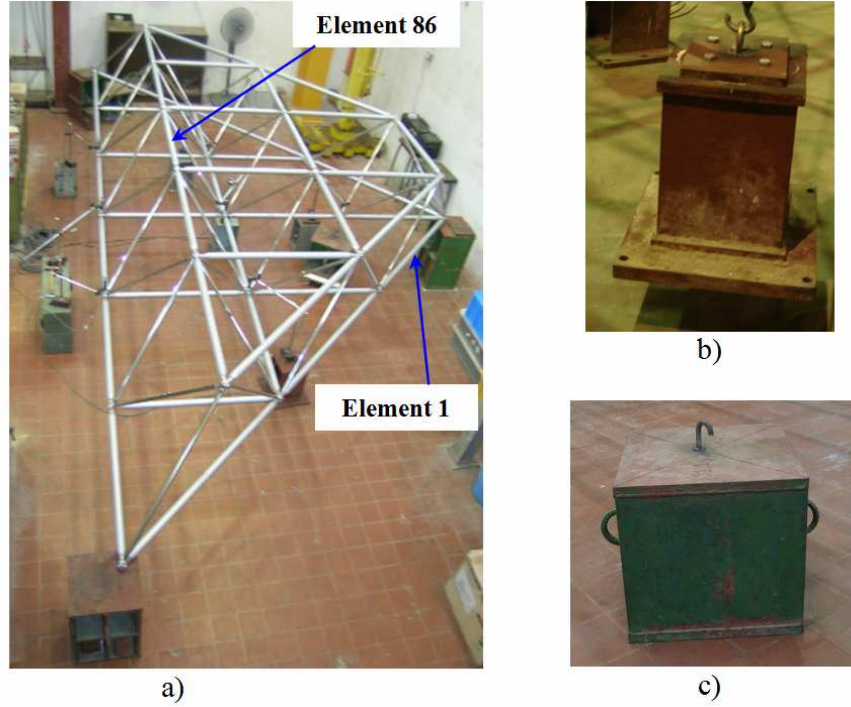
Experimental set-up: a) 3-D modular truss structure; b) static load at reference state; and c) static load at damaged state
